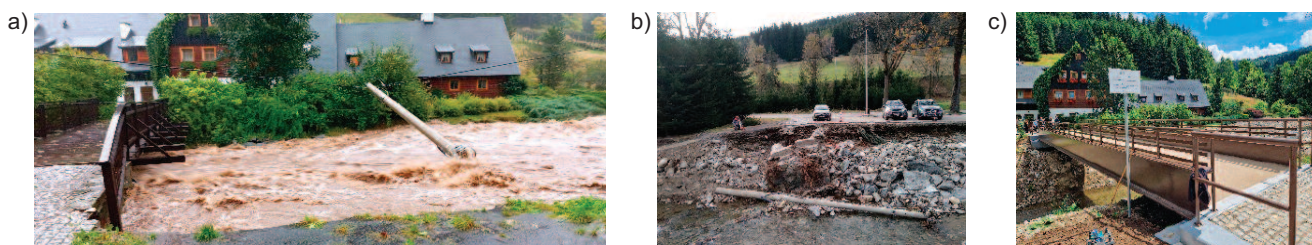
The bridge before destruction (a) (photo by Katarzyna Migala) and the damaged abutment and missing span after the flood (b) and the new bridge built in 2025 (c)
